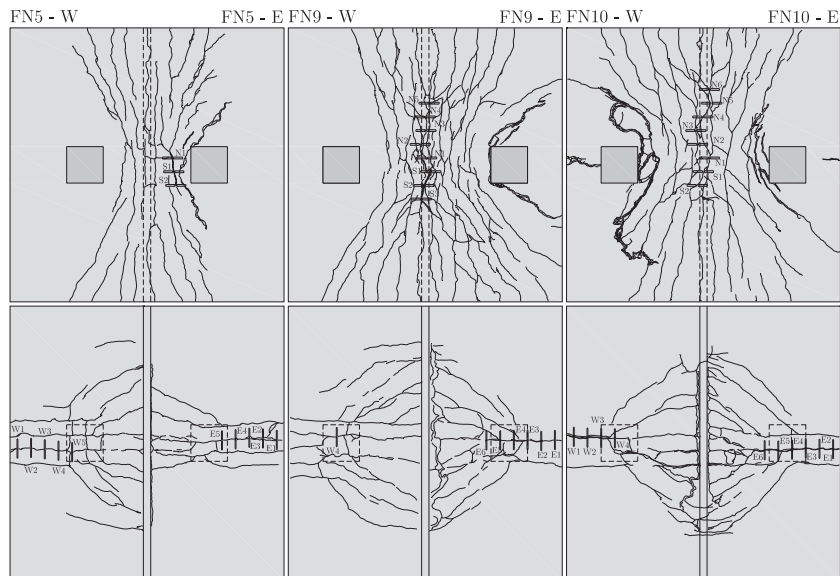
Crack patterns and location of rebar fractures.
